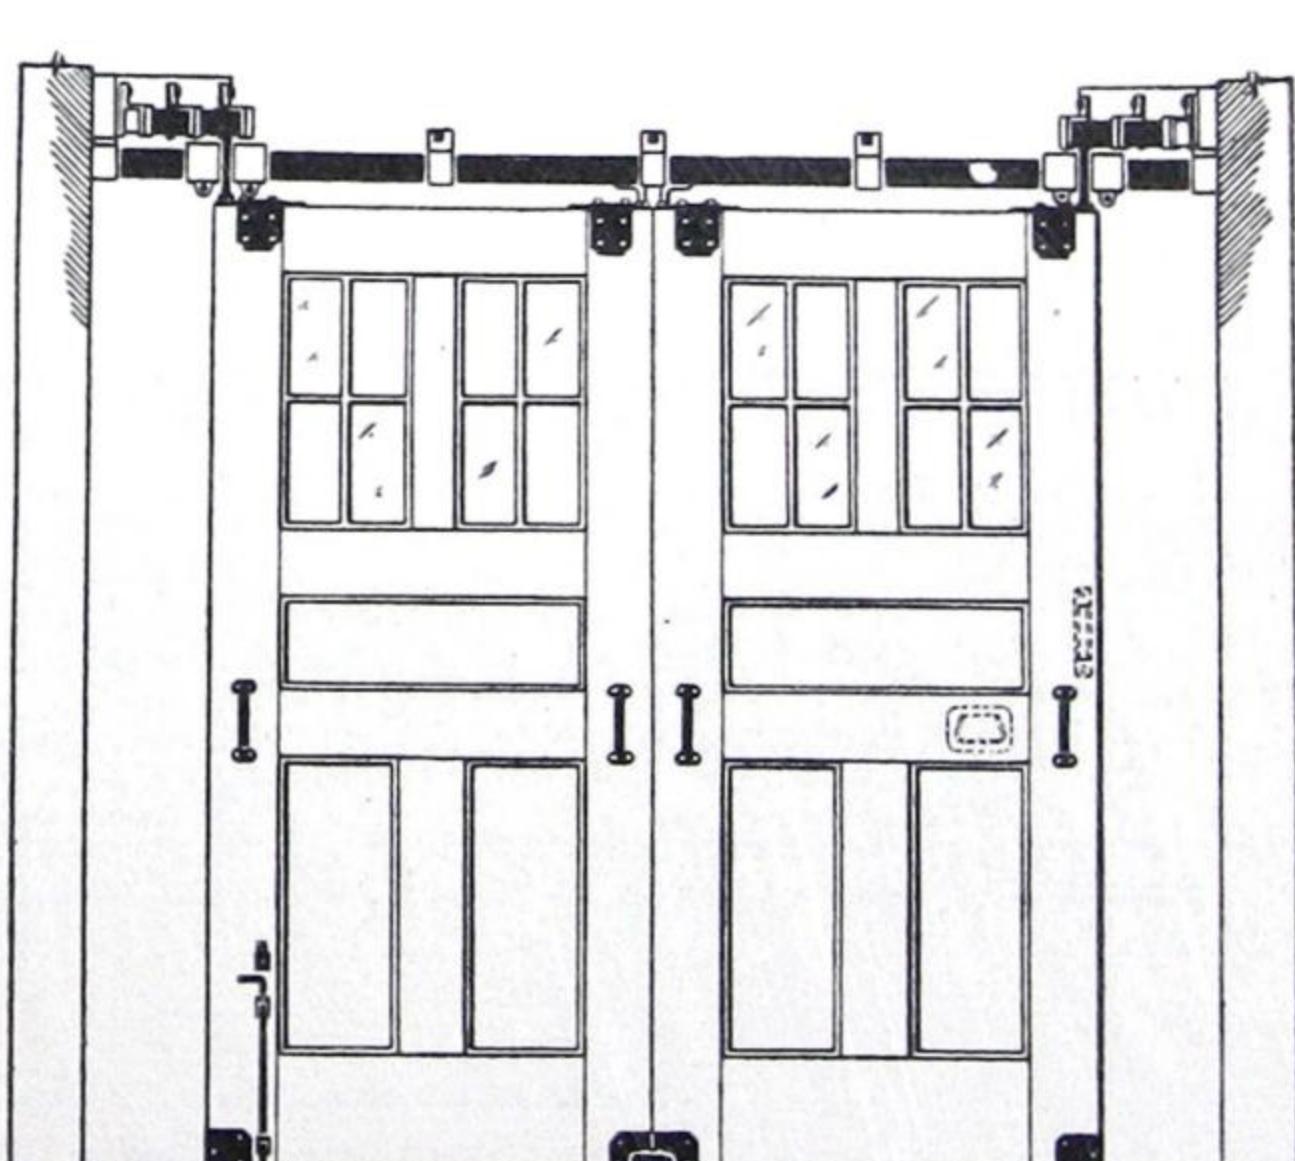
Interior elevation showing Set BB-4, including a 524 Cane Bottom Bolt and a 525 Door Lock.
